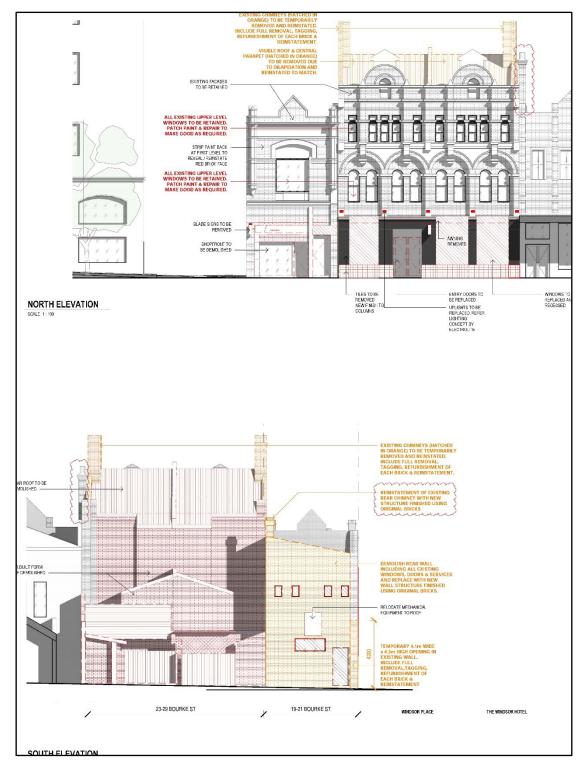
Proposed Demolition Elevations (source: Mills Gorman Architects)
